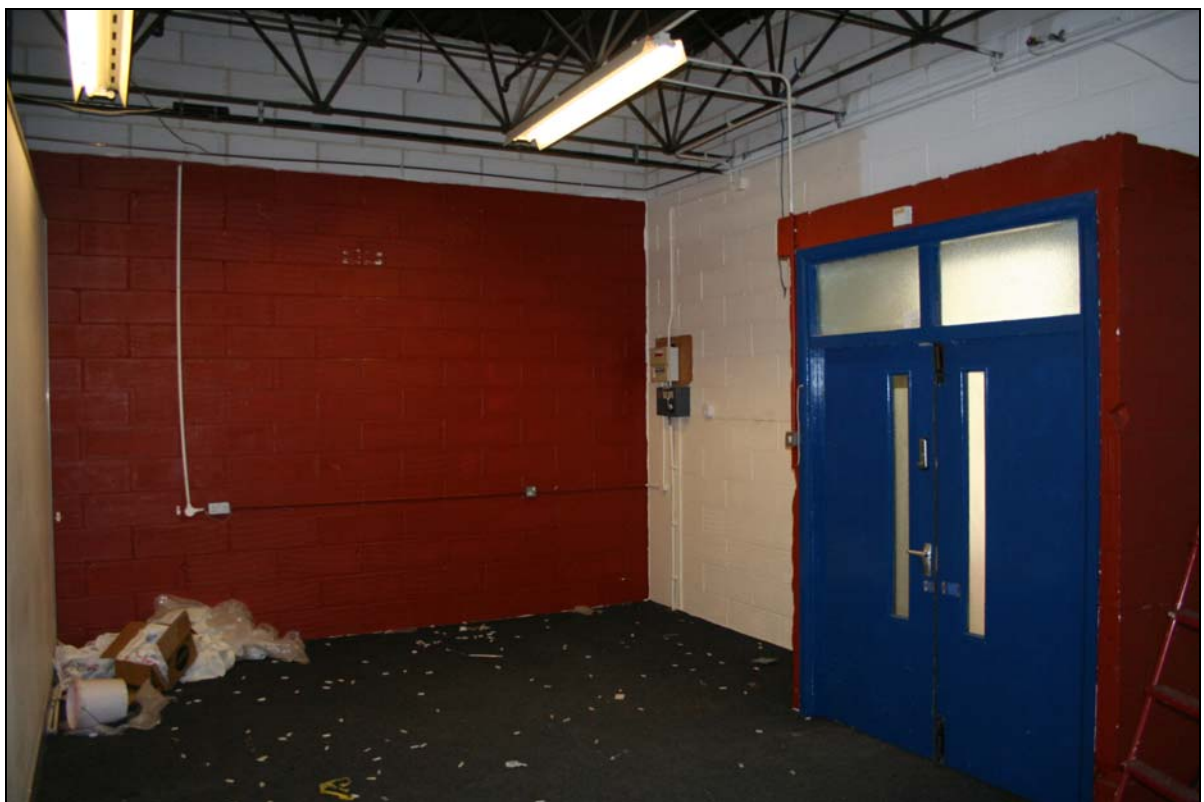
Building B, second floor, unit B208 (FCQ14-0132)
